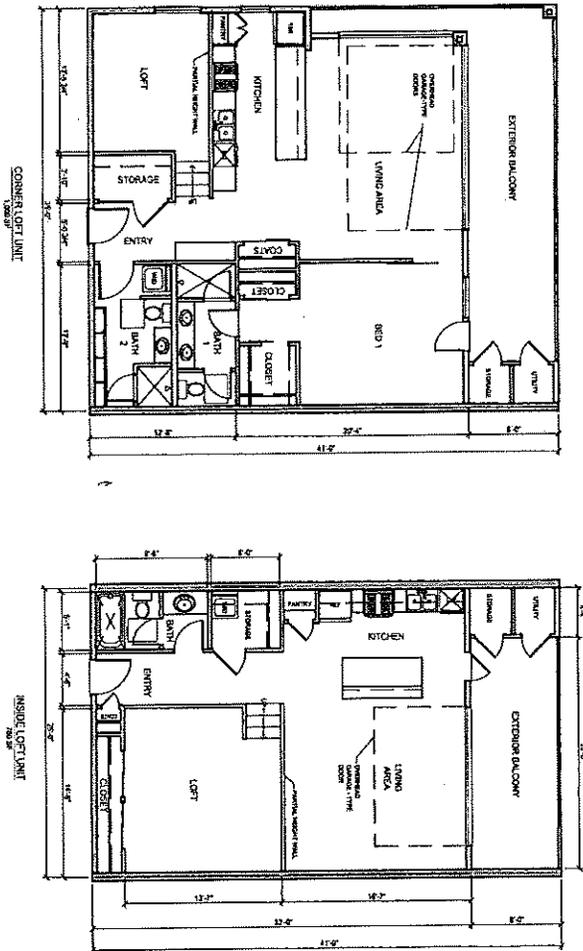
Exhibit BB: North Block: Rail Yard and Mills Loft Unit Plans
